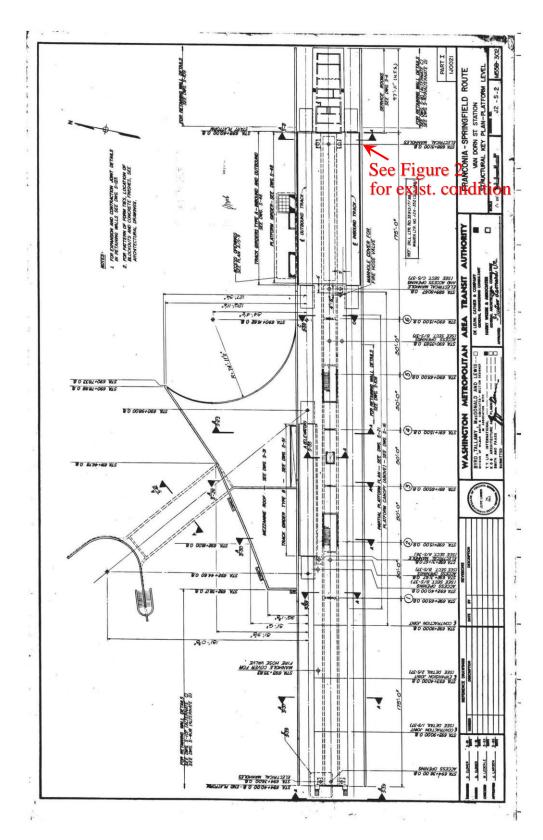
Plan of Van Dorn Street Station shows worst deterioration location. See Figure 8 for section details.
